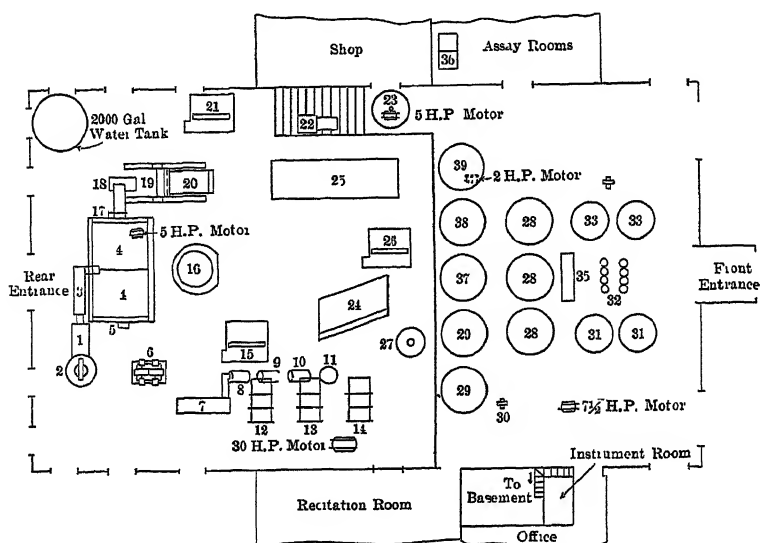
FLOOR-PLAN, ECKLEY B. COXE MINING LABORATORY.
